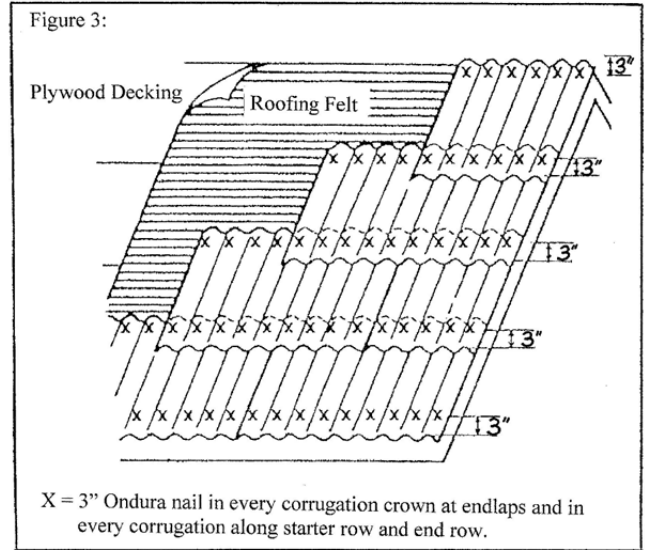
TYPICAL NAILING PATTERN FOR ONDURA® TILES (SEE SYSTEM NO. 4, TABLE 2)
